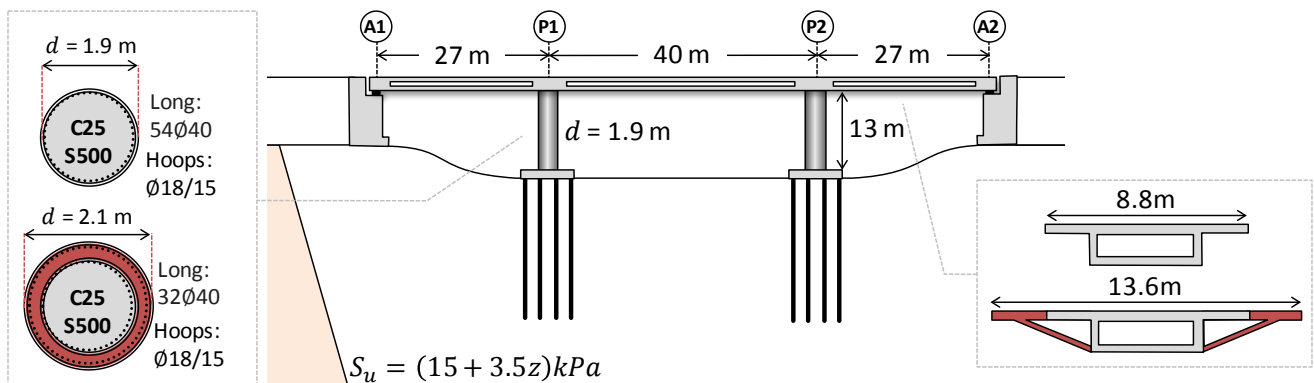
Key attributes of the bridge used prior to and after the deck widening.
